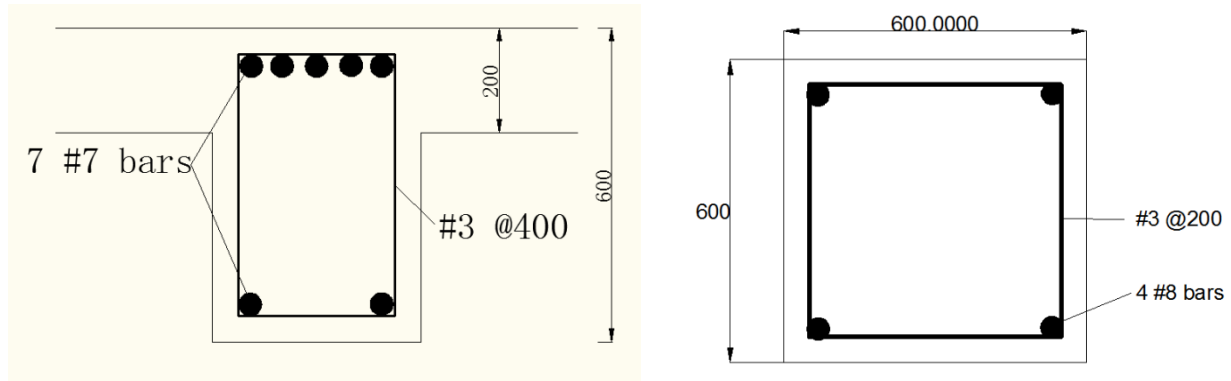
Details of Example Structure Designed Considering Seismic Load
